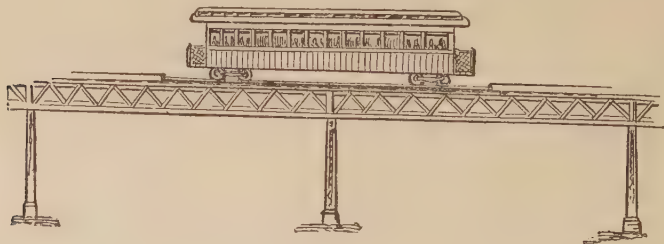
Elevated Railroad, Sixth Avenue, Side View.
